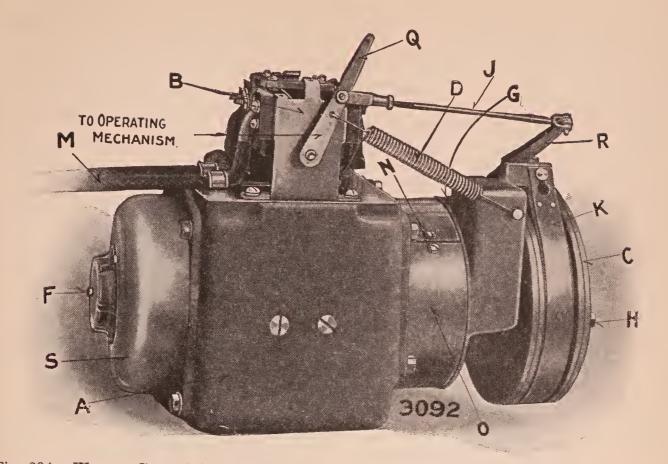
Wagner Control Switch of Drum Type. A—Starter Frame; B—Switch Support; C—Outside End Plate Gear Box; D—Return Spring; F—Oil Hole Screw; G—Self-Closing Oiler; H—Oil Plug; J—Connecting Rod; K—Brake Band; M—Battery Leads; N—End Plate Screws; O—Back End Plate Shield; Q—Starting Switch Lever; R—Brake Band Lever; S—Front End Plate Shield
